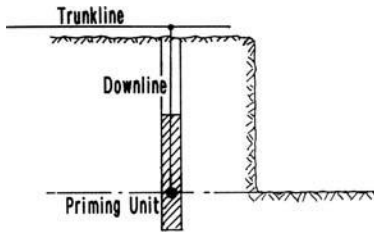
Cross-section showing the charging and initiating design for a single hole.
